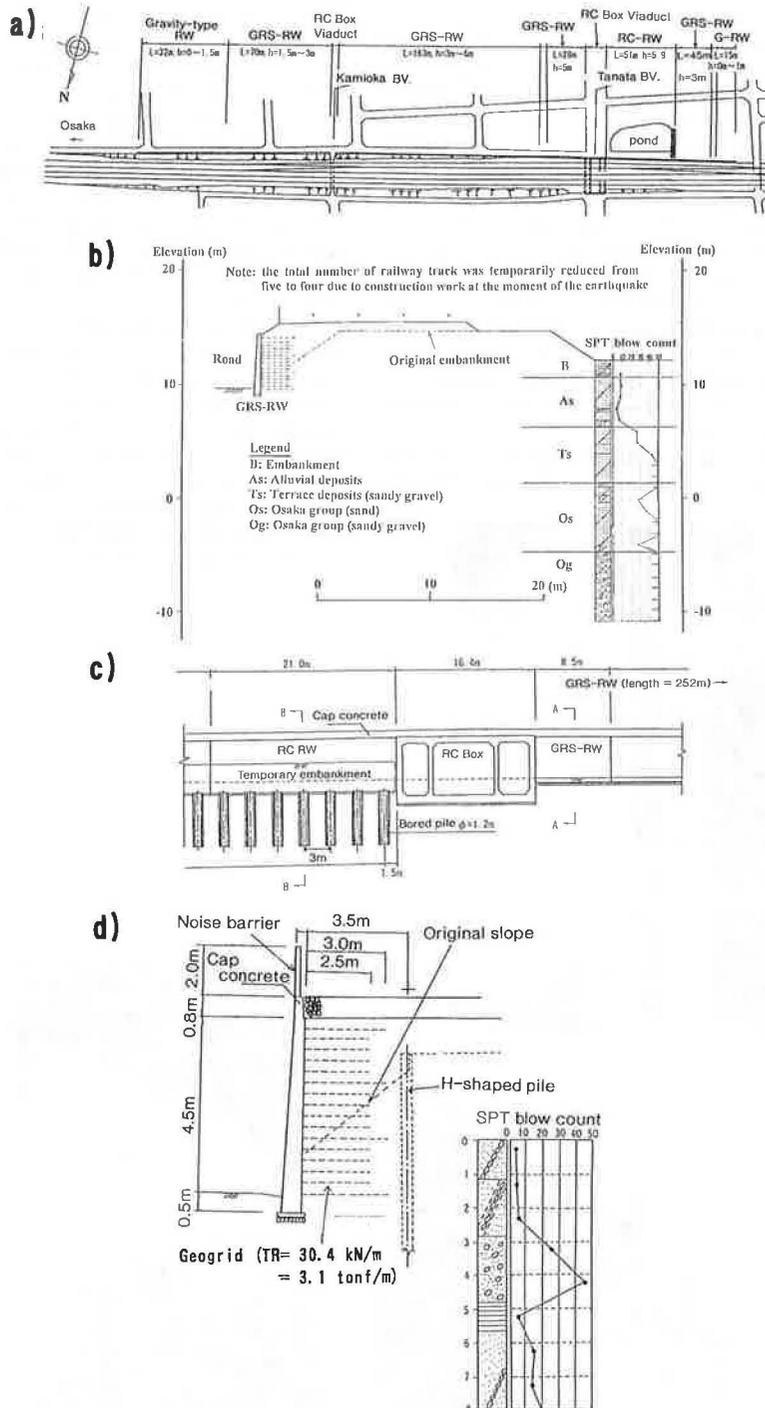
a) Plan of the site, b) cross-section of embankment, c) front view from south of GRS-RW and RC retaining walls supported with a pile foundation, and d) typical cross-section of the GRS-RW, Tanata (No. 5 in Fig.3 and GR1 in Fig. 22)
